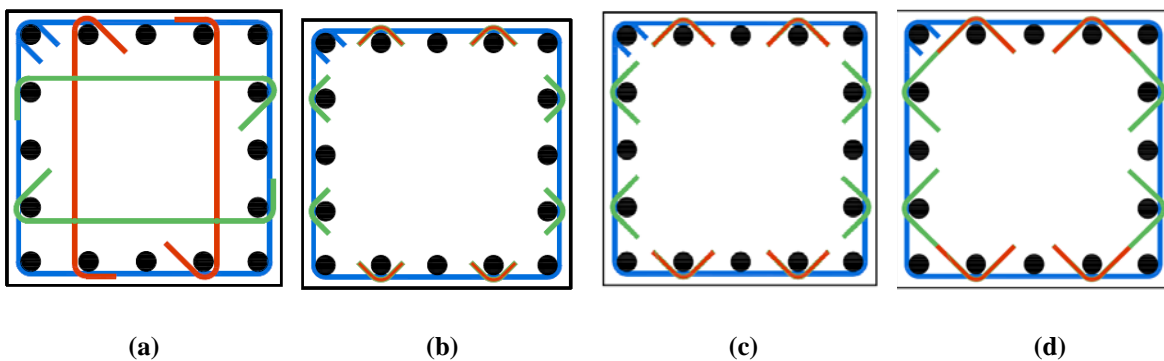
Specifications of transverse reinforcement for all columns with a 500 by 500 mm cross-section; (a) COC; (b) COV-7; (c) COV-10.5; (d) COV-14.
